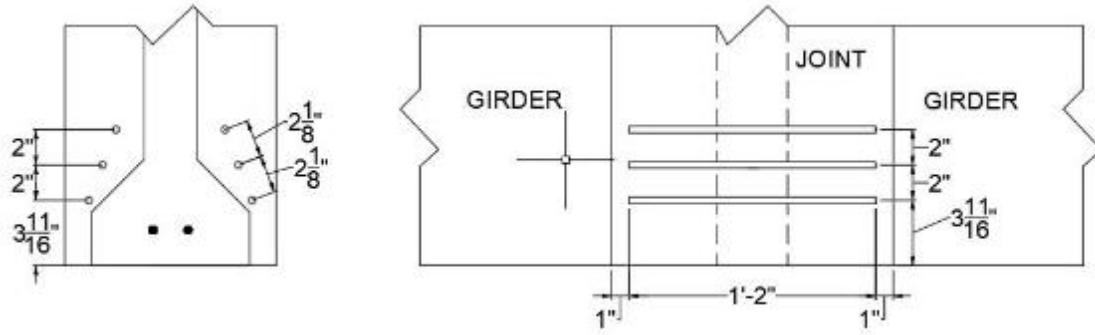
Retrofit continuity joint mild steel detail for positive moment
